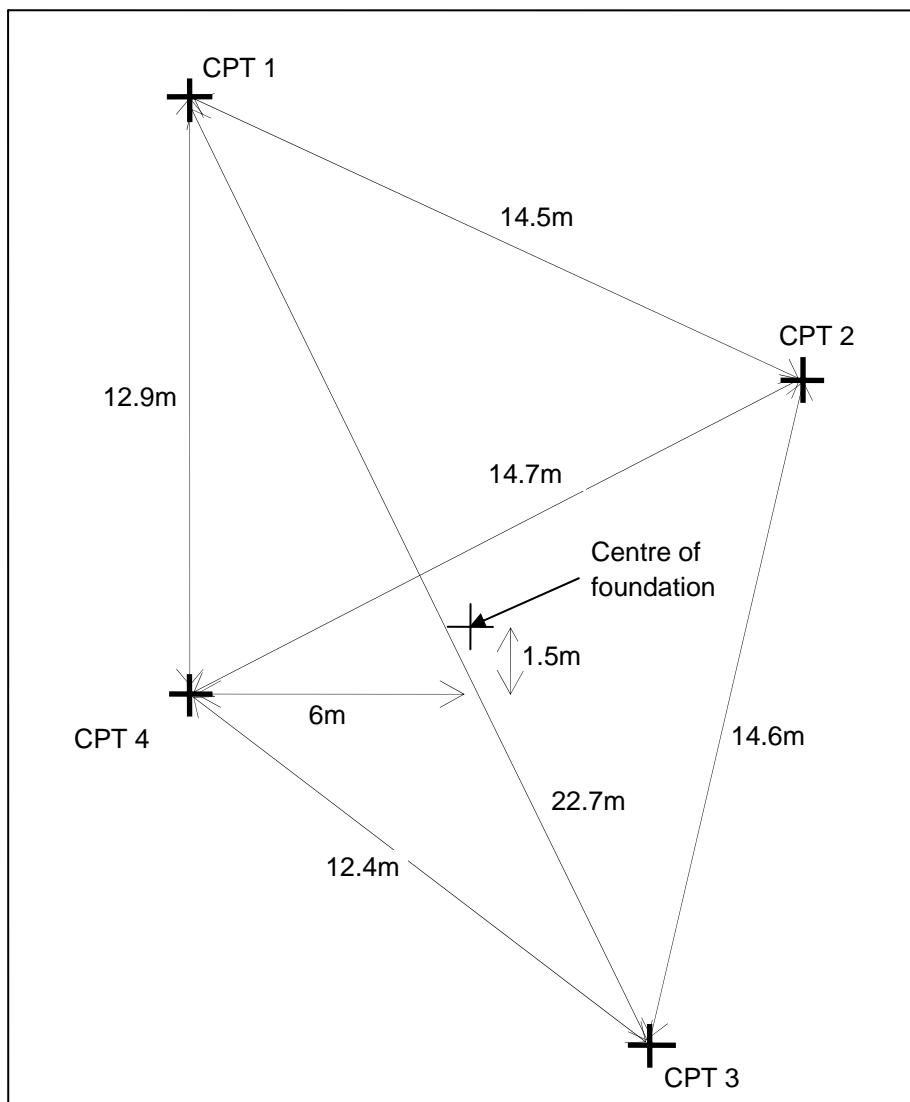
Example 2.1 Site plan and location of CPT tests
